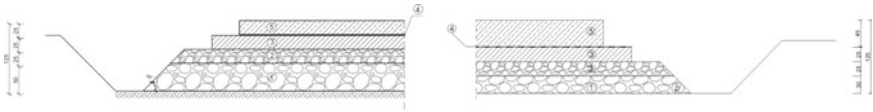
Fragment of cross-section of prestressed runway—variant I and dowelled concrete structure—variant II: 1 gravel, 2 sand-gravel mix, 3 concrete subgrade, 4 sliding layer, 5 surface layer (Source Own study)
